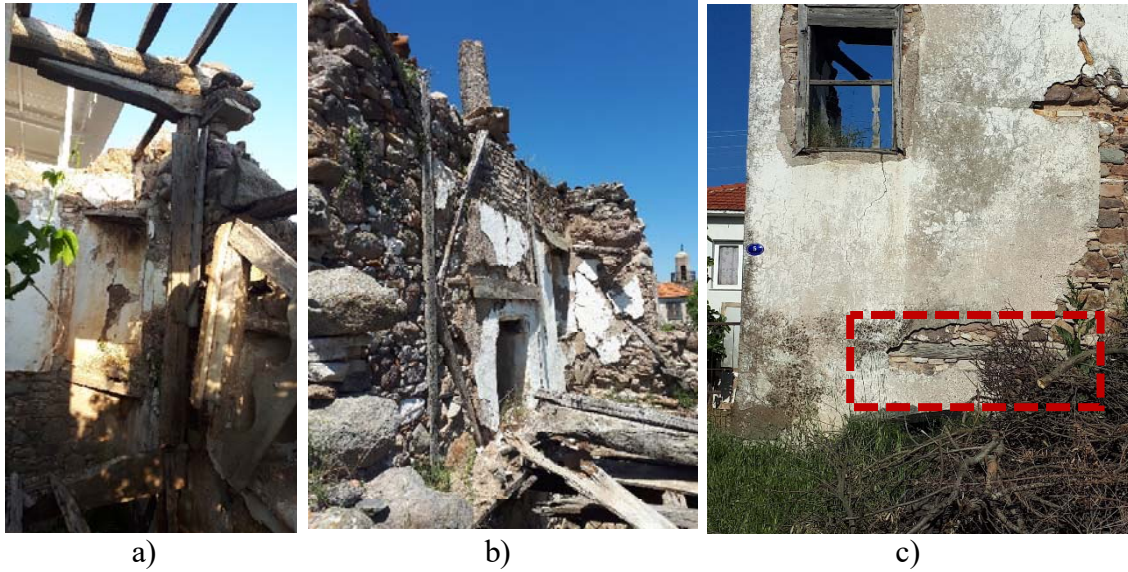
a) Wooden column adjacent to wall, transition element on top of it. May 2, 2017. b) Mixed use of timber frame and stone masonry. April 27, 2017. c) Wooden tie beam. April 26, 2017
